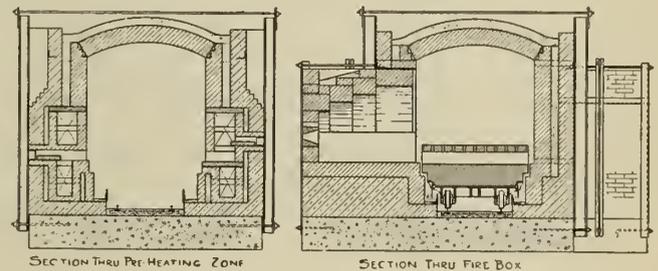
Two Cross Sections through a single-tunnel Kiln.
